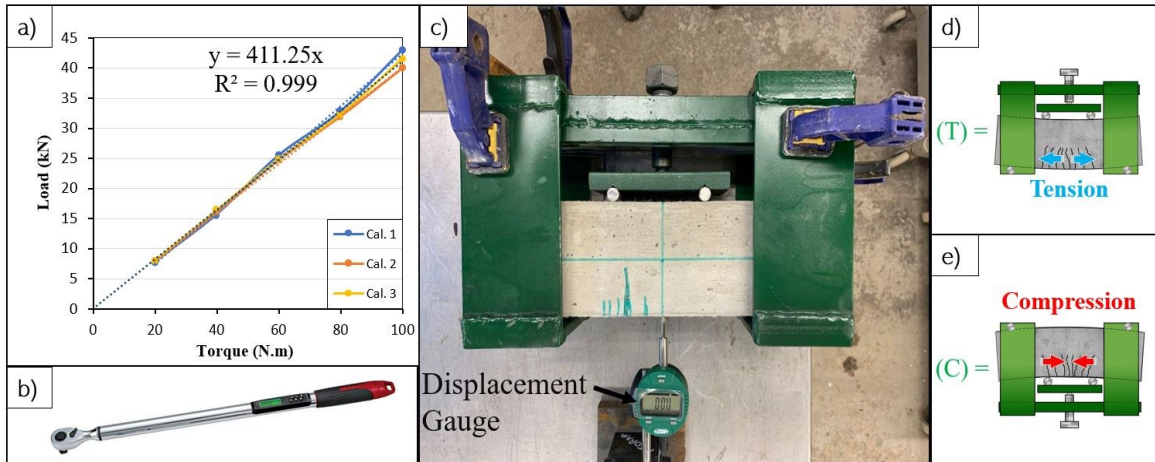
Sustained loading fixture setup tools and test conditions, a) Torque vs. load calibration of the torque wrench, b) ACDelco digital torque wrench, c) sustained loading fixture clamped to the table and displacement gauge fixed at the mid-span, d) cracks under sustained tension and, e) cracks under sustained compression
